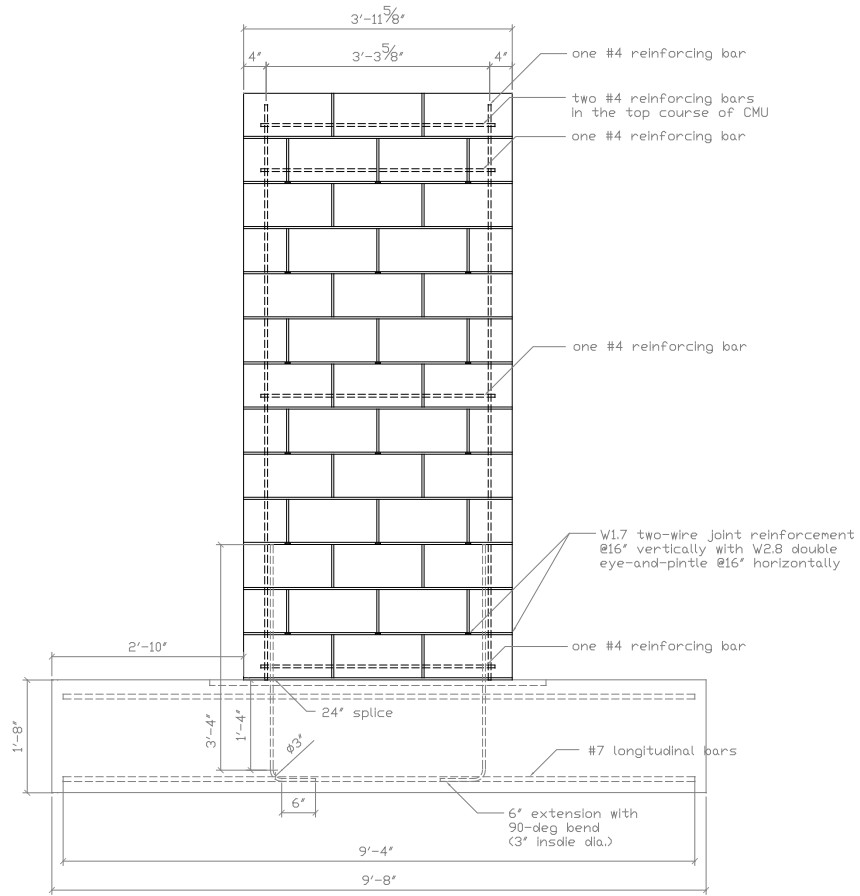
Rear view of specimen UT CMU 3 and UCSD CMU 3
